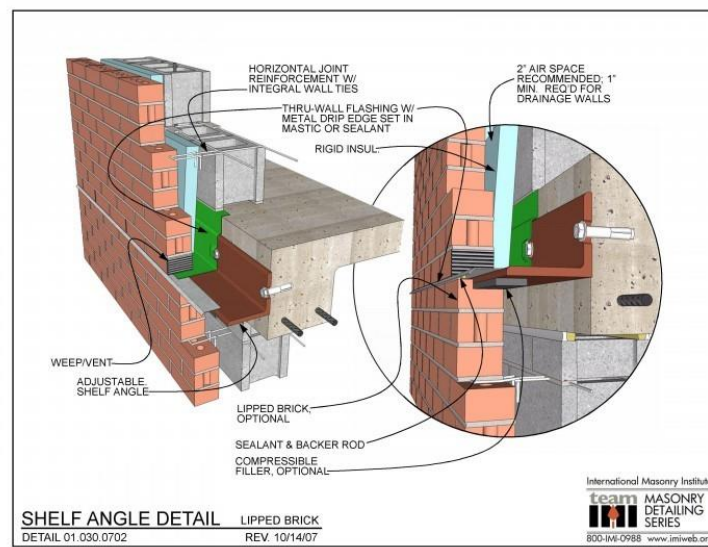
Brick veneer detail illustrating steel angle and wire ties
